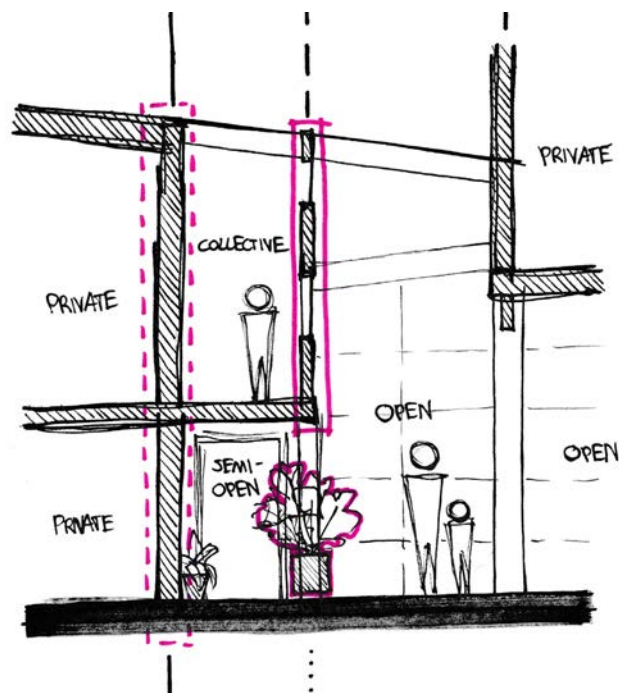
(section in plan fig. 7.49) 'Transition zone' with different borders; closed wall, transparent wall with windows and movable objects like plants (by author)
